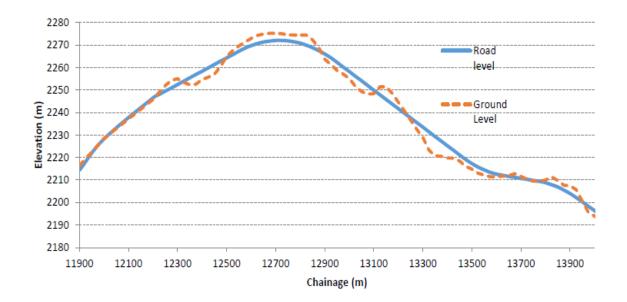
Vertical alignment of the Jointed Plain Concrete Pavement
